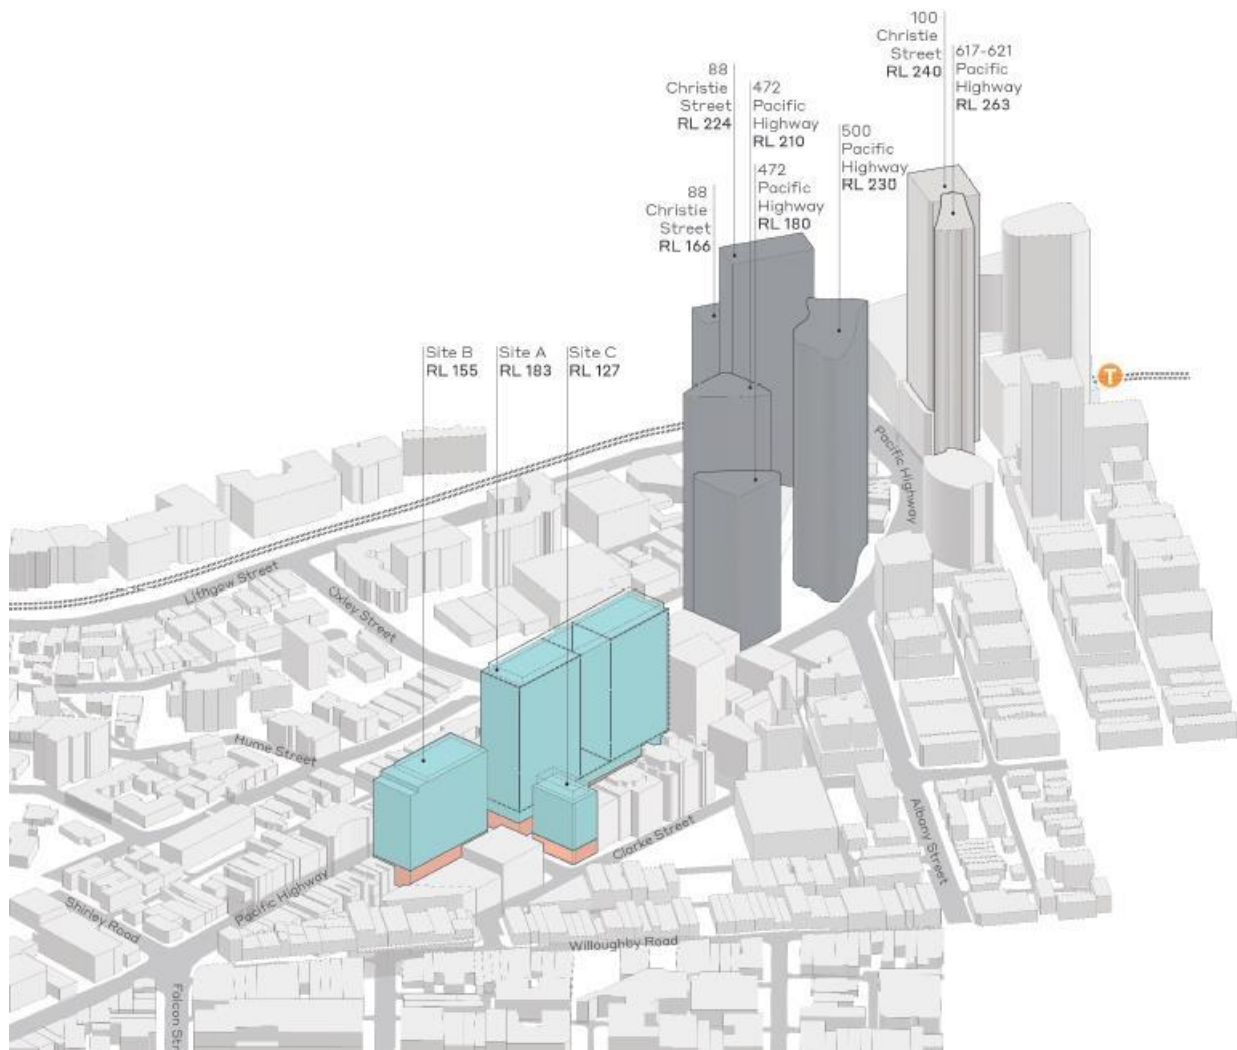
Proposed Crows Nest OSD building envelope (axonometric diagram) and future high-rise development in the St Leonards Town Centre (Sydney Metro’s EIS)
